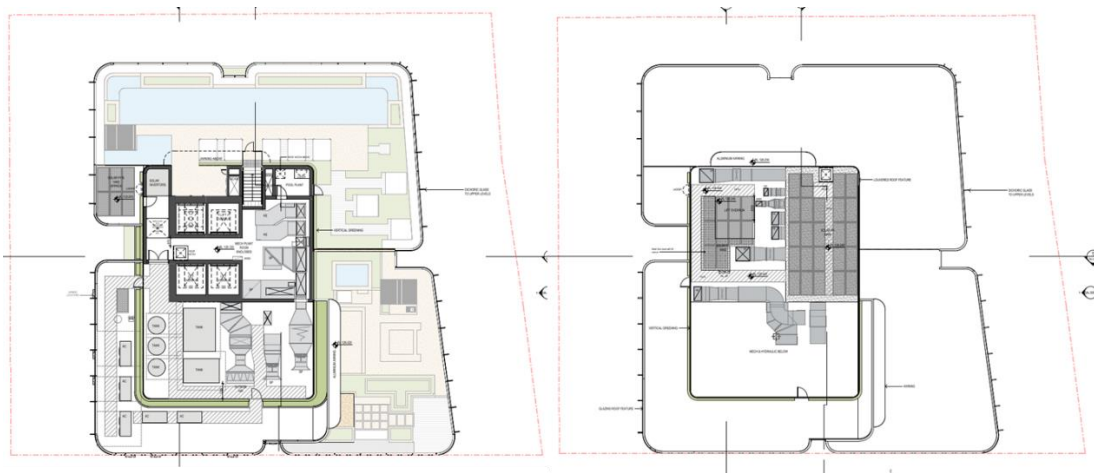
| Proposed Roof Plans (Source: Applicant's Architectural Plans)
